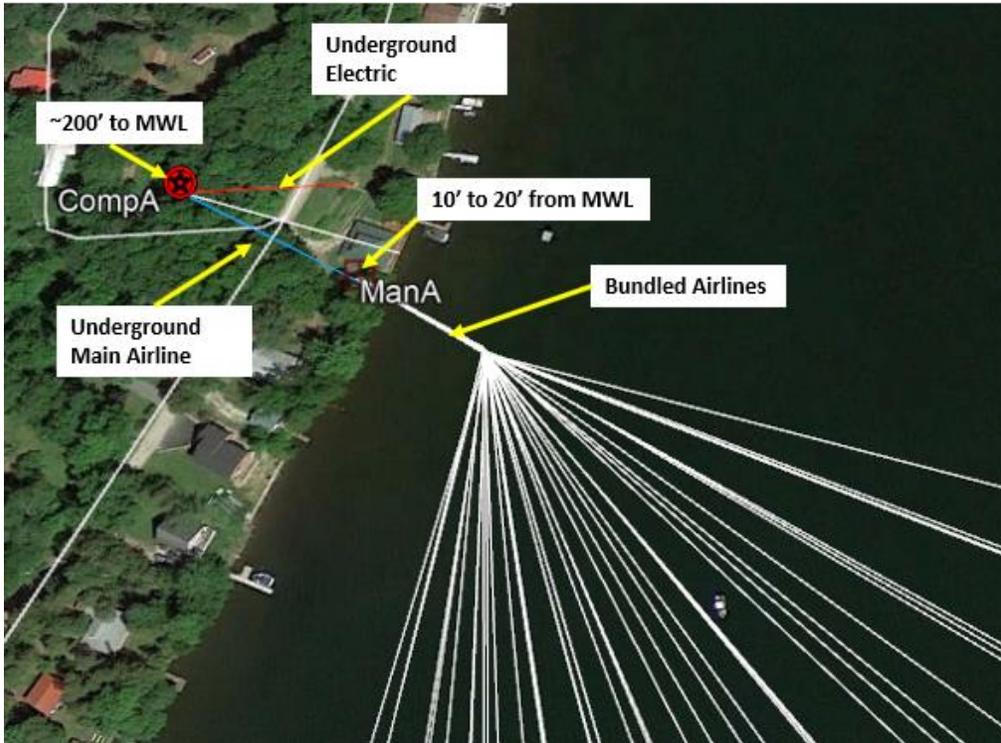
Lake Carmi Proposed Aeration System Site Plan
